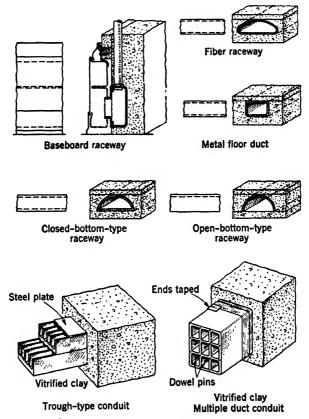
Some types of raceways cast in concrete or plaster walls. All adjoining ends are covered and taped to exclude drippings from wet concrete or plaster.
